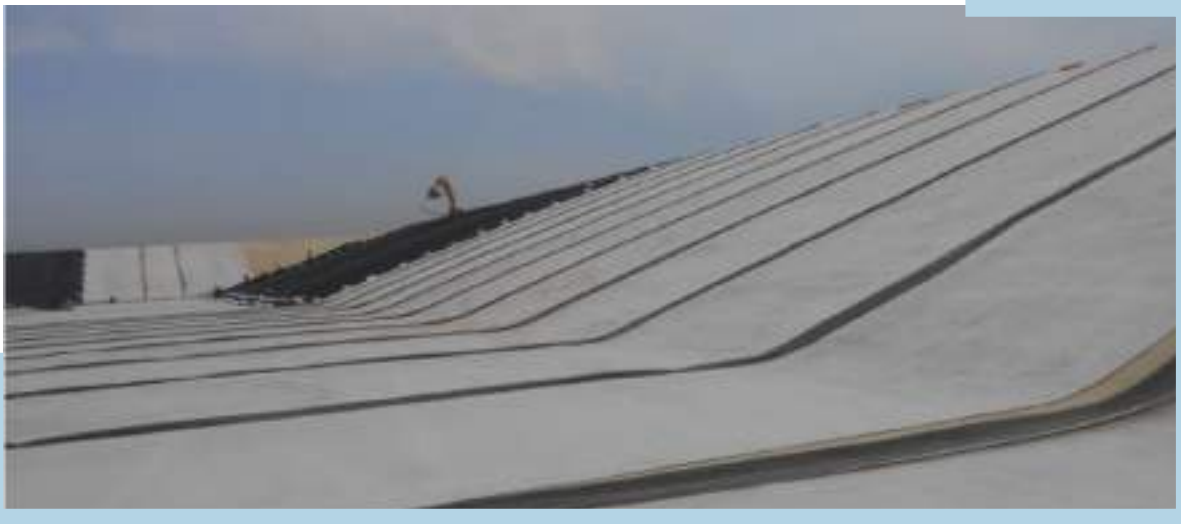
North-Kuwait Landfill Geo-textile Placement Side Slope
